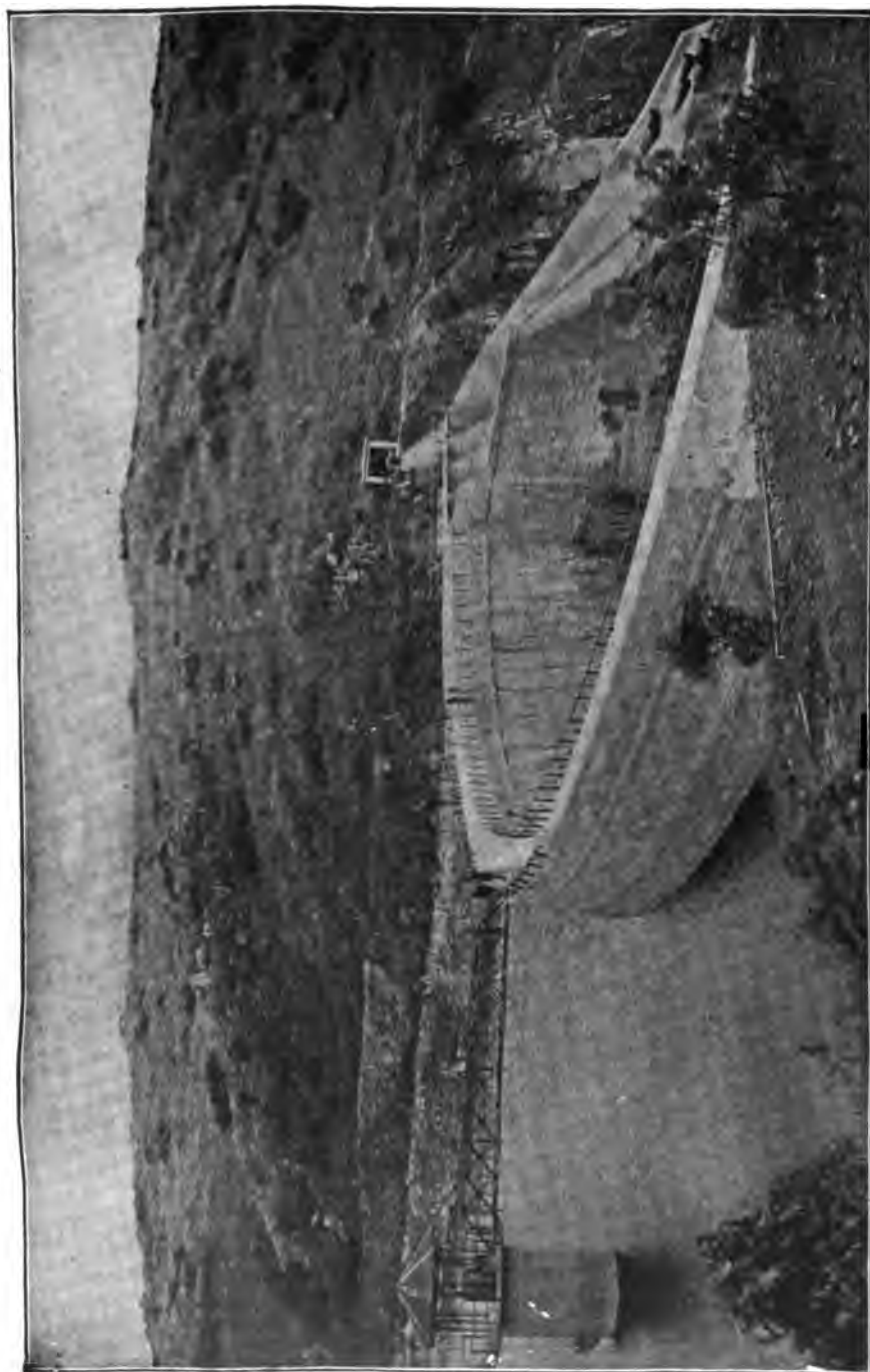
SWEETWATER (CAL.) MASONRY DAM.
